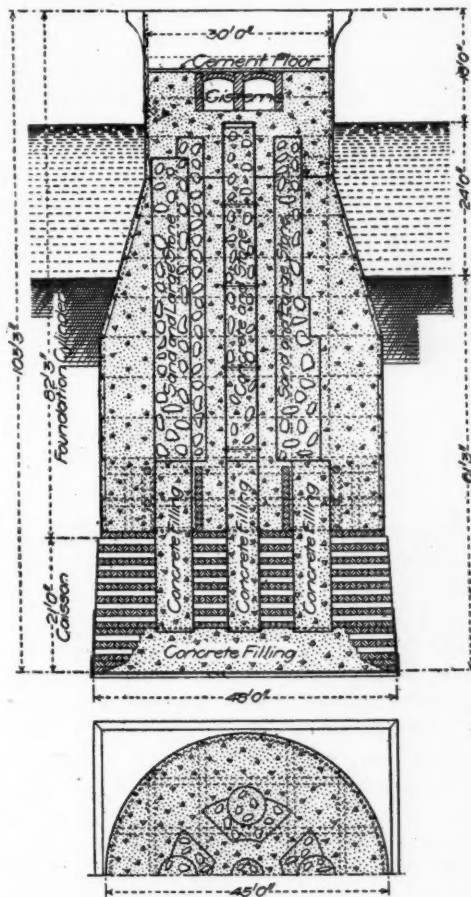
VERTICAL SECTION OF FOUNDATION.
